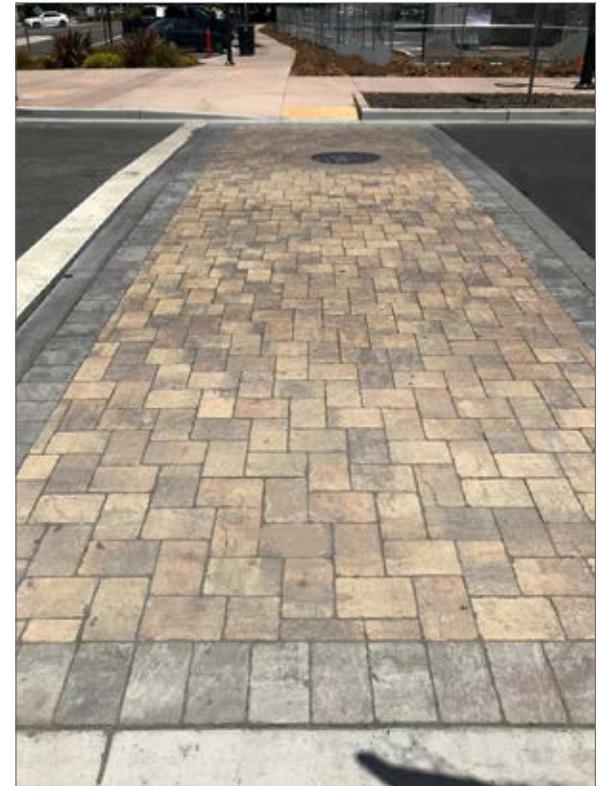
Precast Concrete Paver Crosswalk (Vehicular Strength rated)
